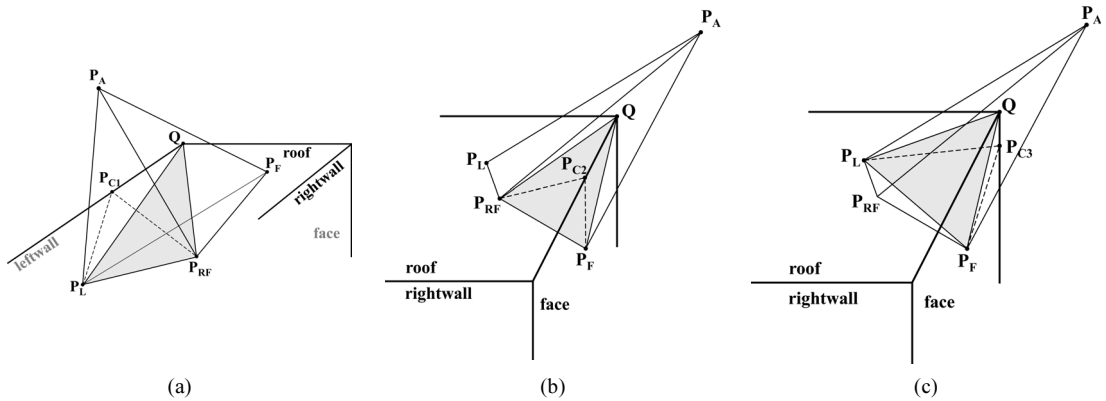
Sliding faces of block formed across the three excavation surfaces (a) leftwall - roof, (b) roof - face, (c) face - leftwall
